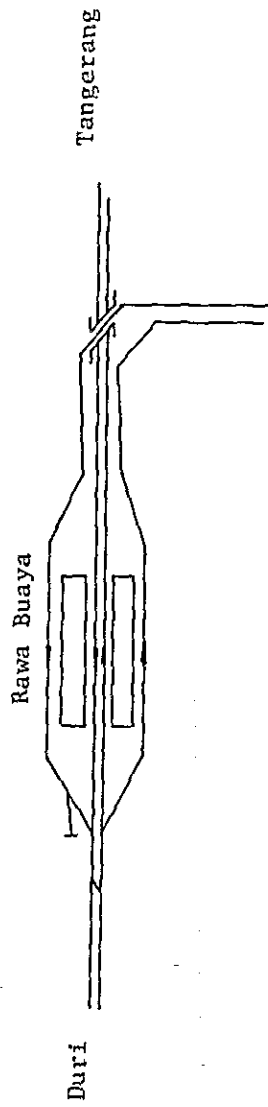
Sketch of Track Layout (Rawa Buaya)
